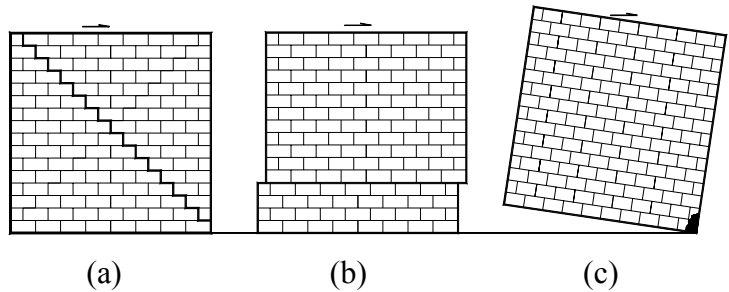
In-Plane Failure Mechanisms Of Laterally Loaded URM Wall, (A) Shear Failure, (B) Sliding Failure, (C) Rocking Failure.
